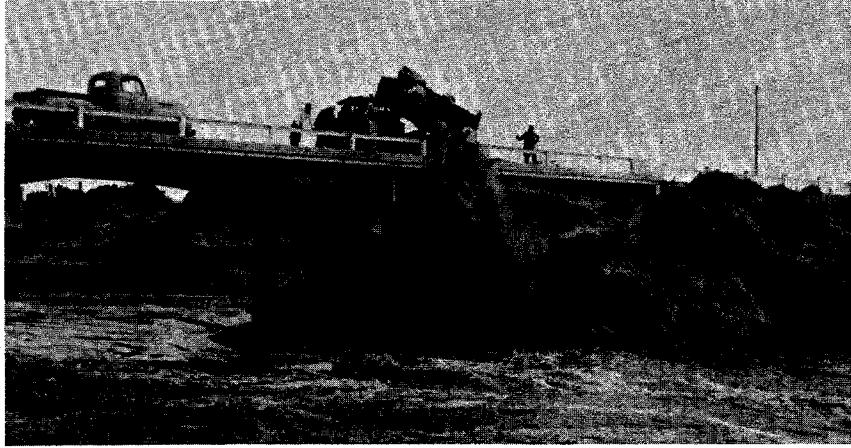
Erosion of sacked concrete from left bank on downstream side of bridge. Note fall in water surface beneath bridge and eddy near left bank causing lateral erosion of approach embankment. (From Nevada Dept. of Highways.)
